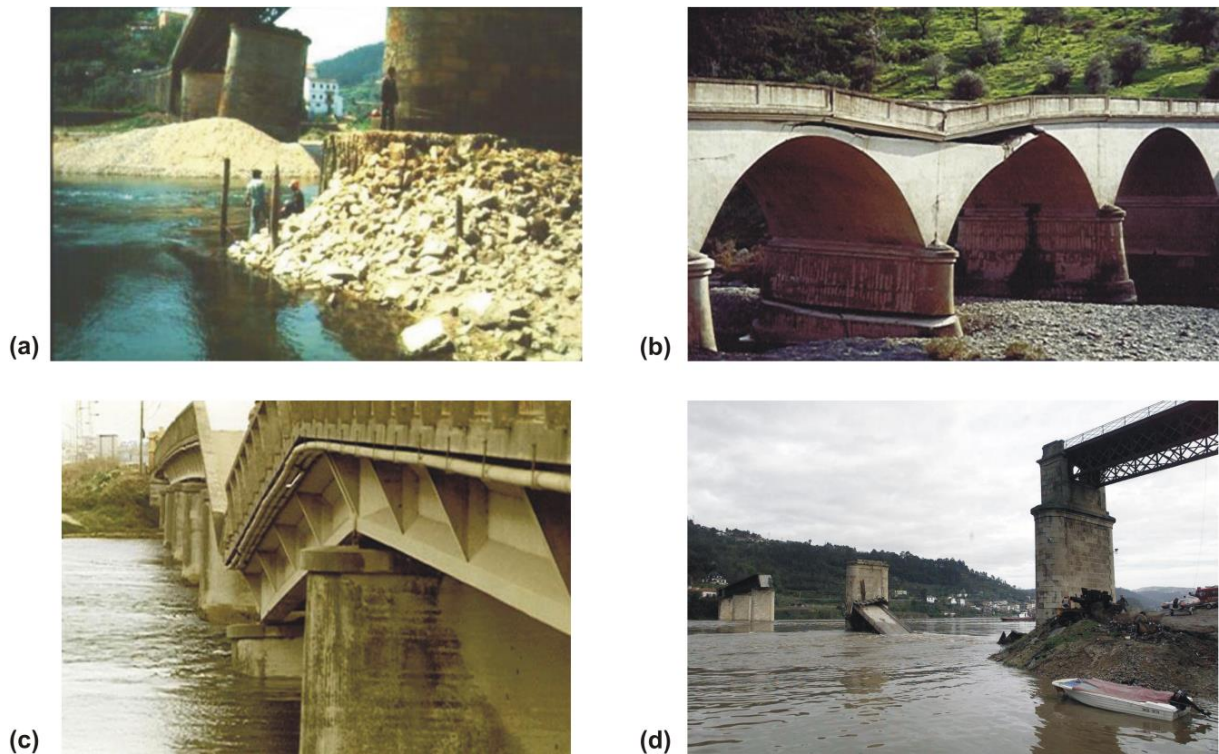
Examples of bridge failures in Portugal: (a) Penacova bridge, (b) EN122 bridge, (c) Gafanha bridge and (d) Hintze Ribeiro bridge (photos a to c by J. Rocha)
